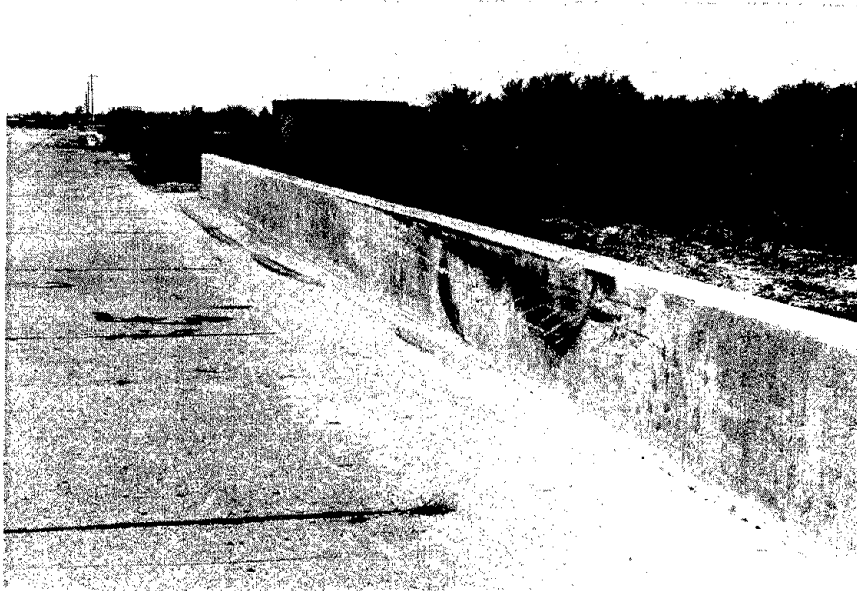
32-in (813-mm) concrete parapet after test 7069-16.
